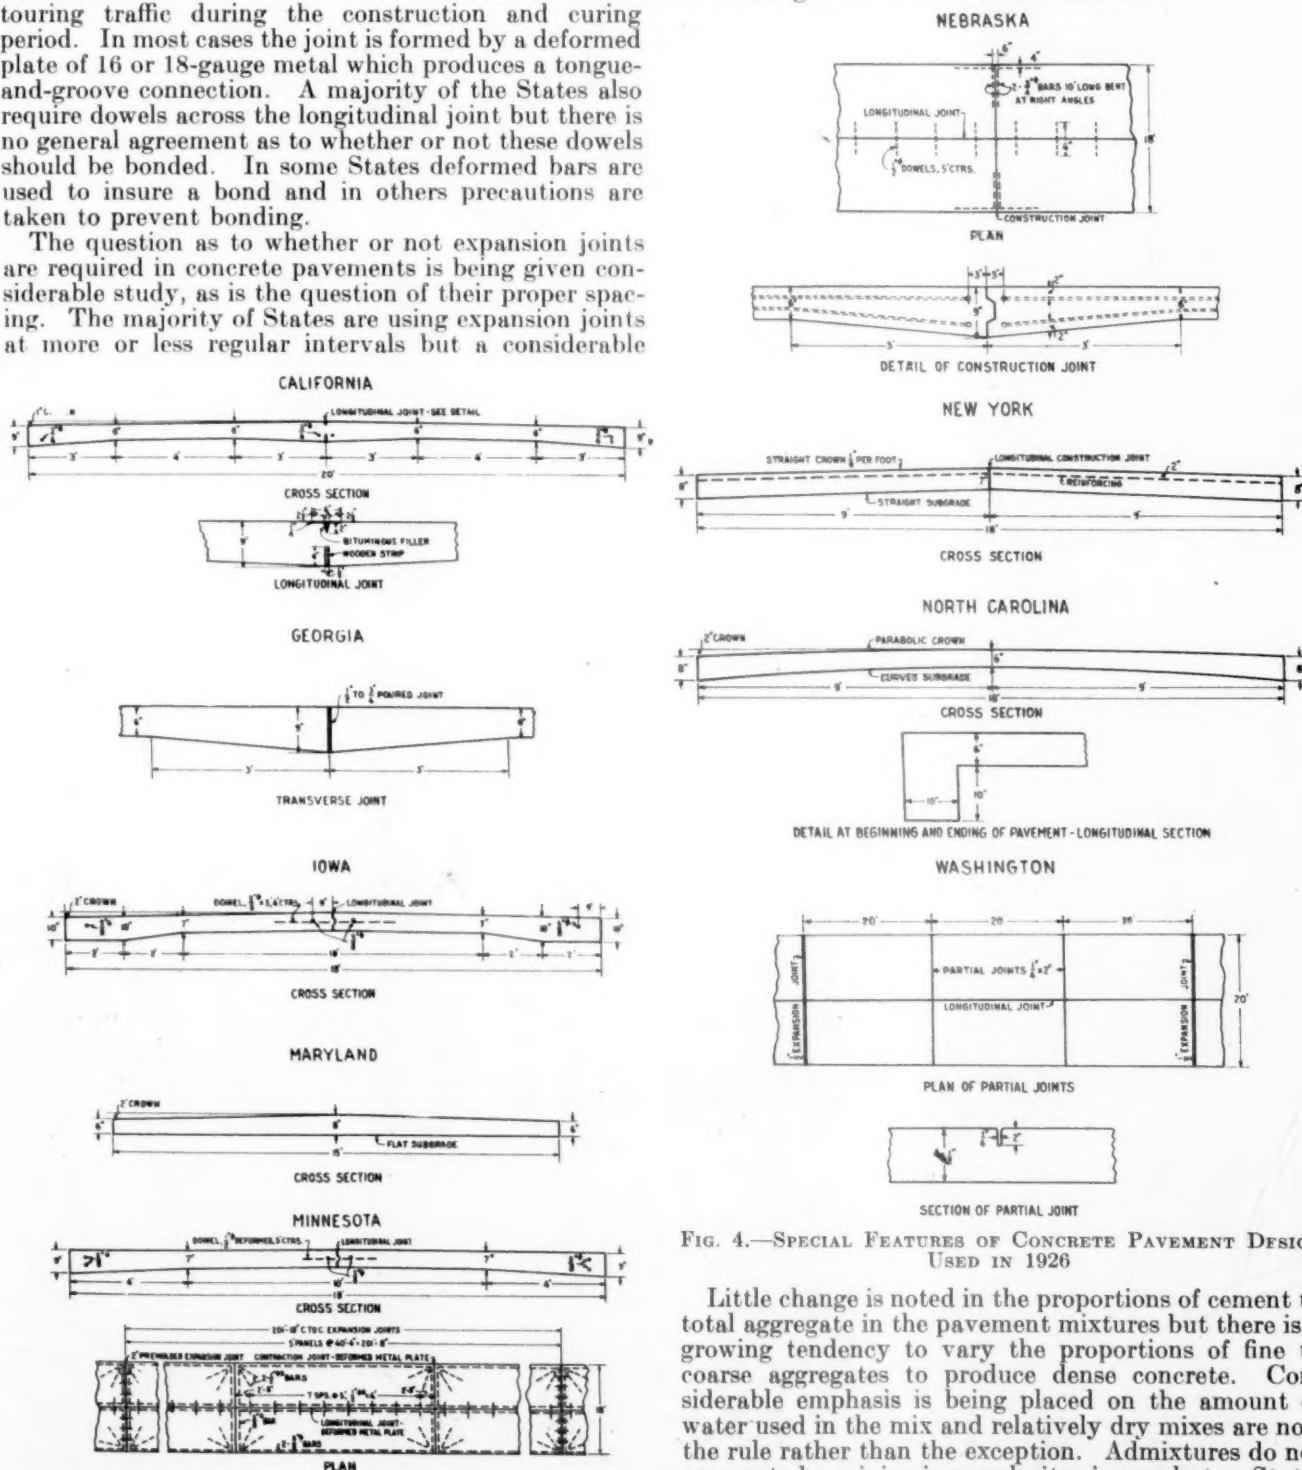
SPECIAL FEATURES OF CONCRETE PAVEMENT DESIGN USED IN 1926
